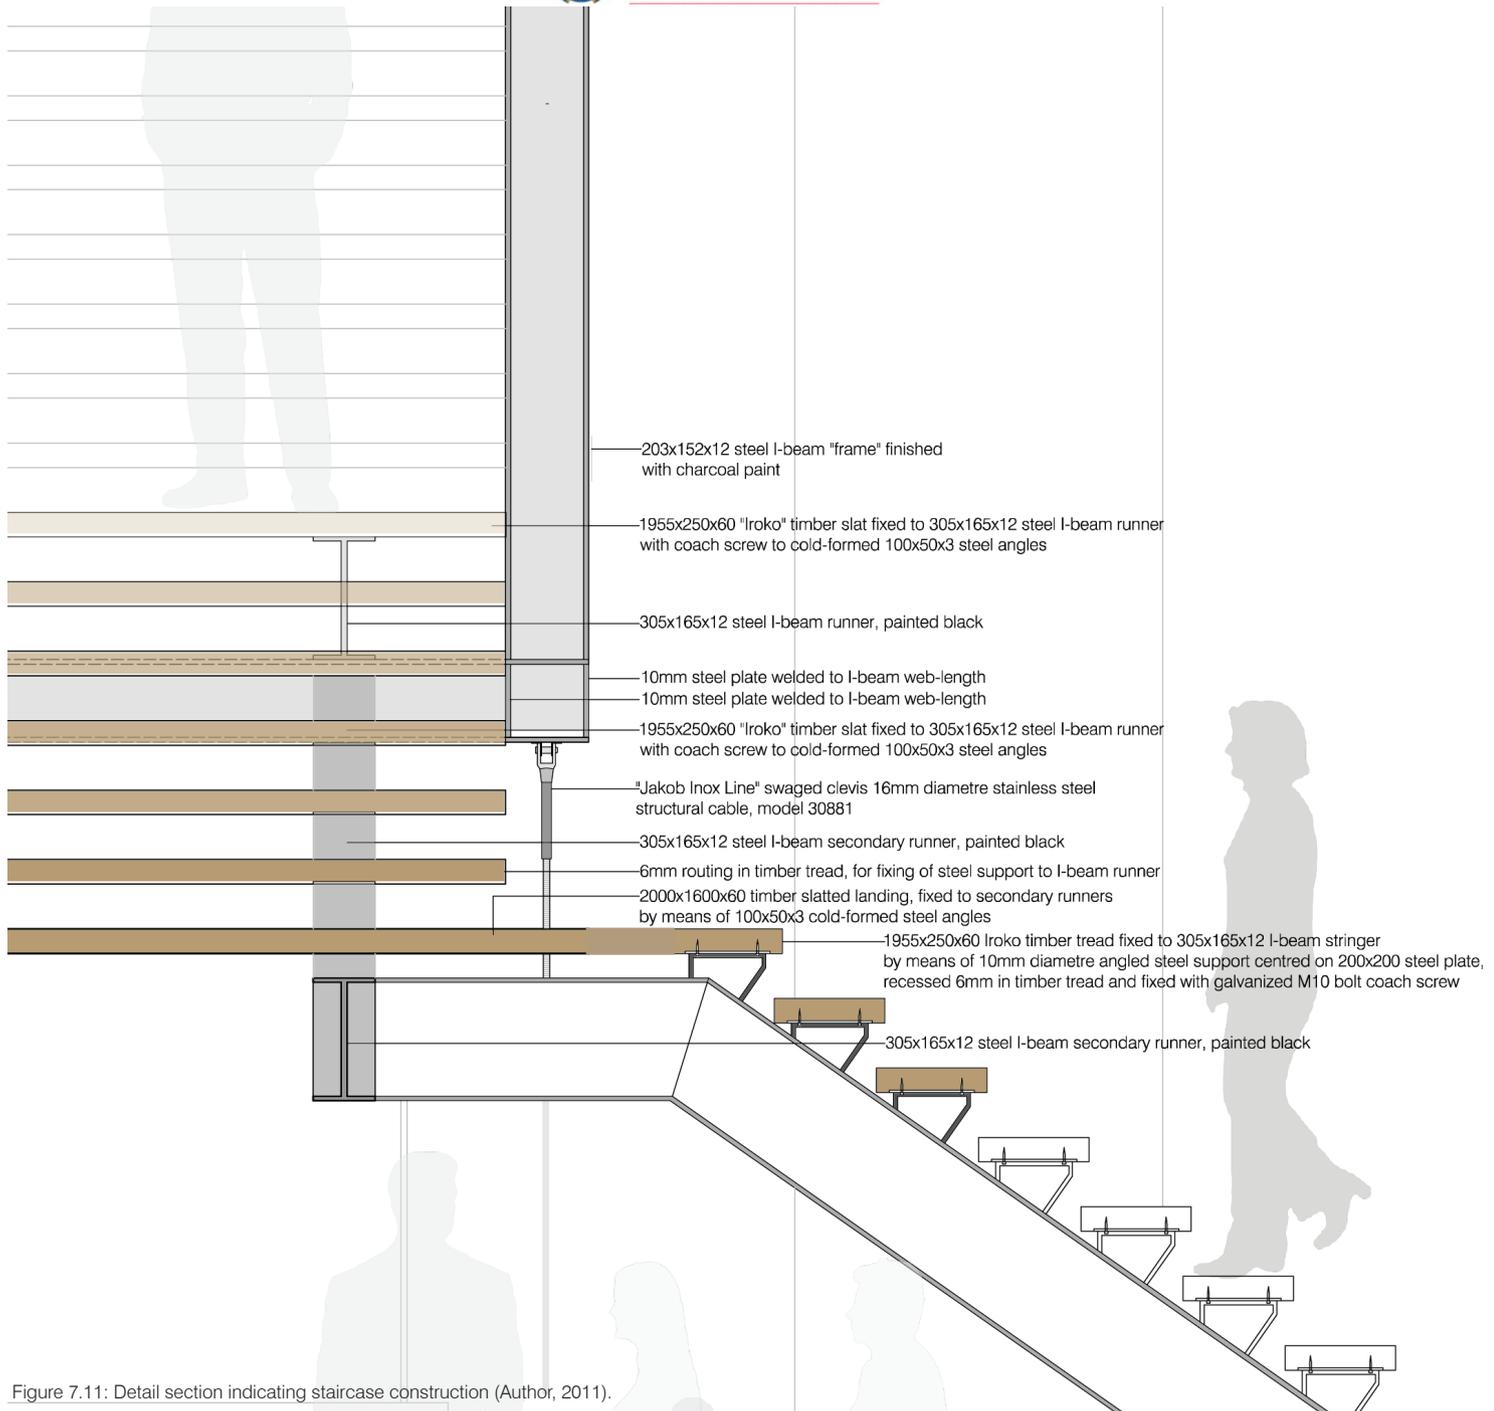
Detail section indicating staircase construction (Author, 2011).
